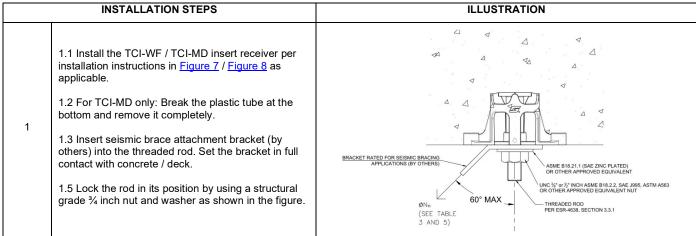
OBLIQUE TENSION INSTALLATION INSTRUCTIONS
